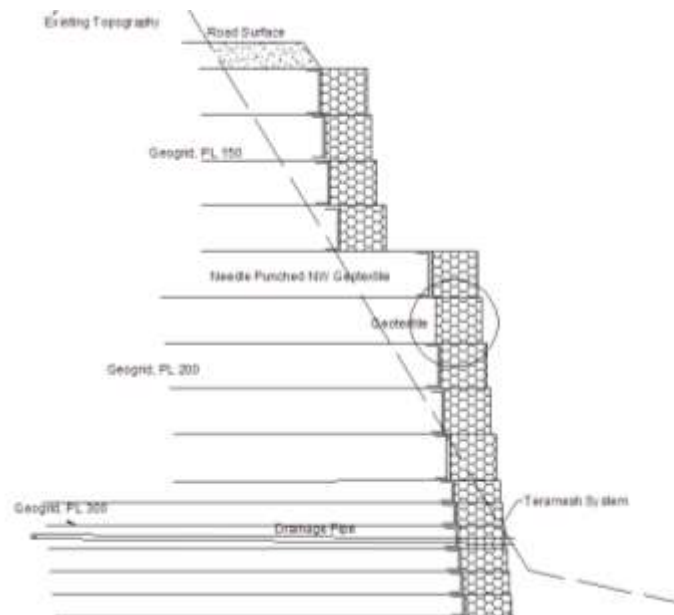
Typical Road Cross Section Showing Reinforced Soil Wall
